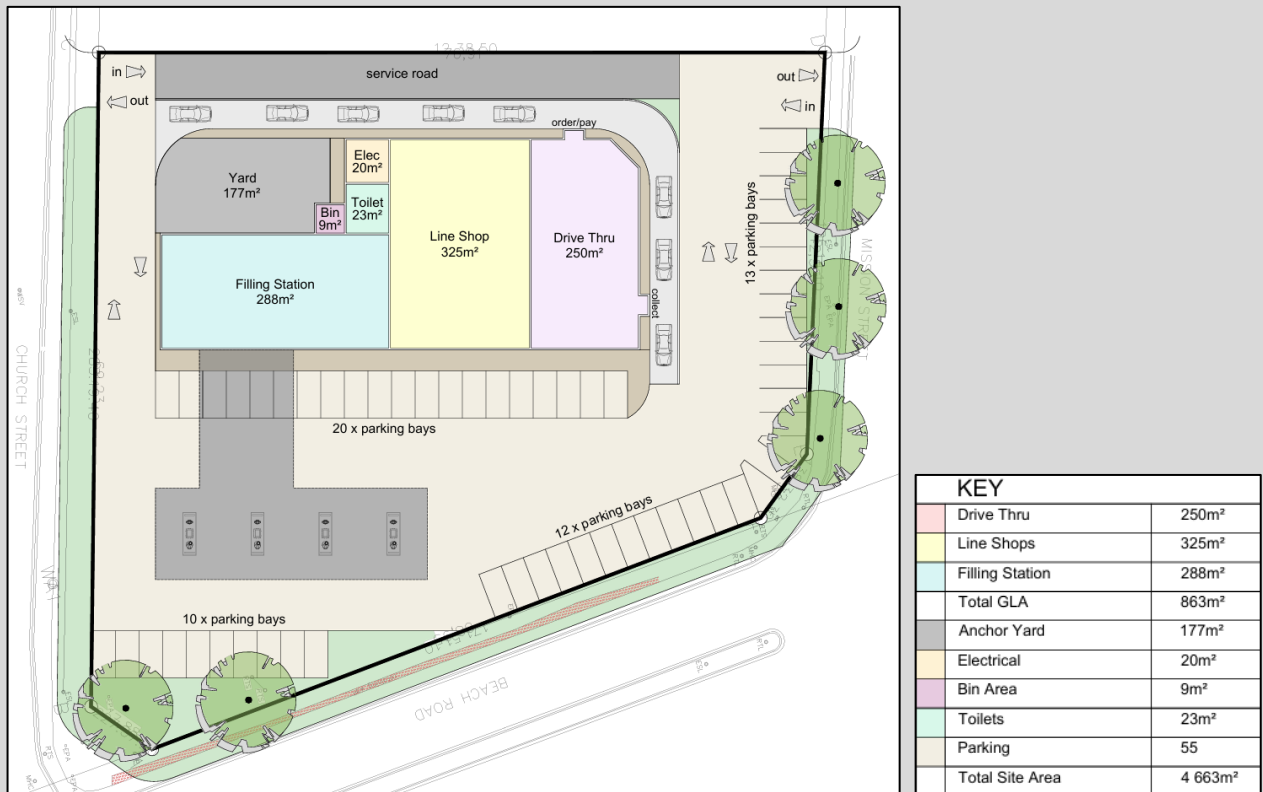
Site Development Plan of proposed DBAR filling station on Erf 7379, Pacaltsdorp (Gareths Calvert Designs t/a CCA, 2021).
